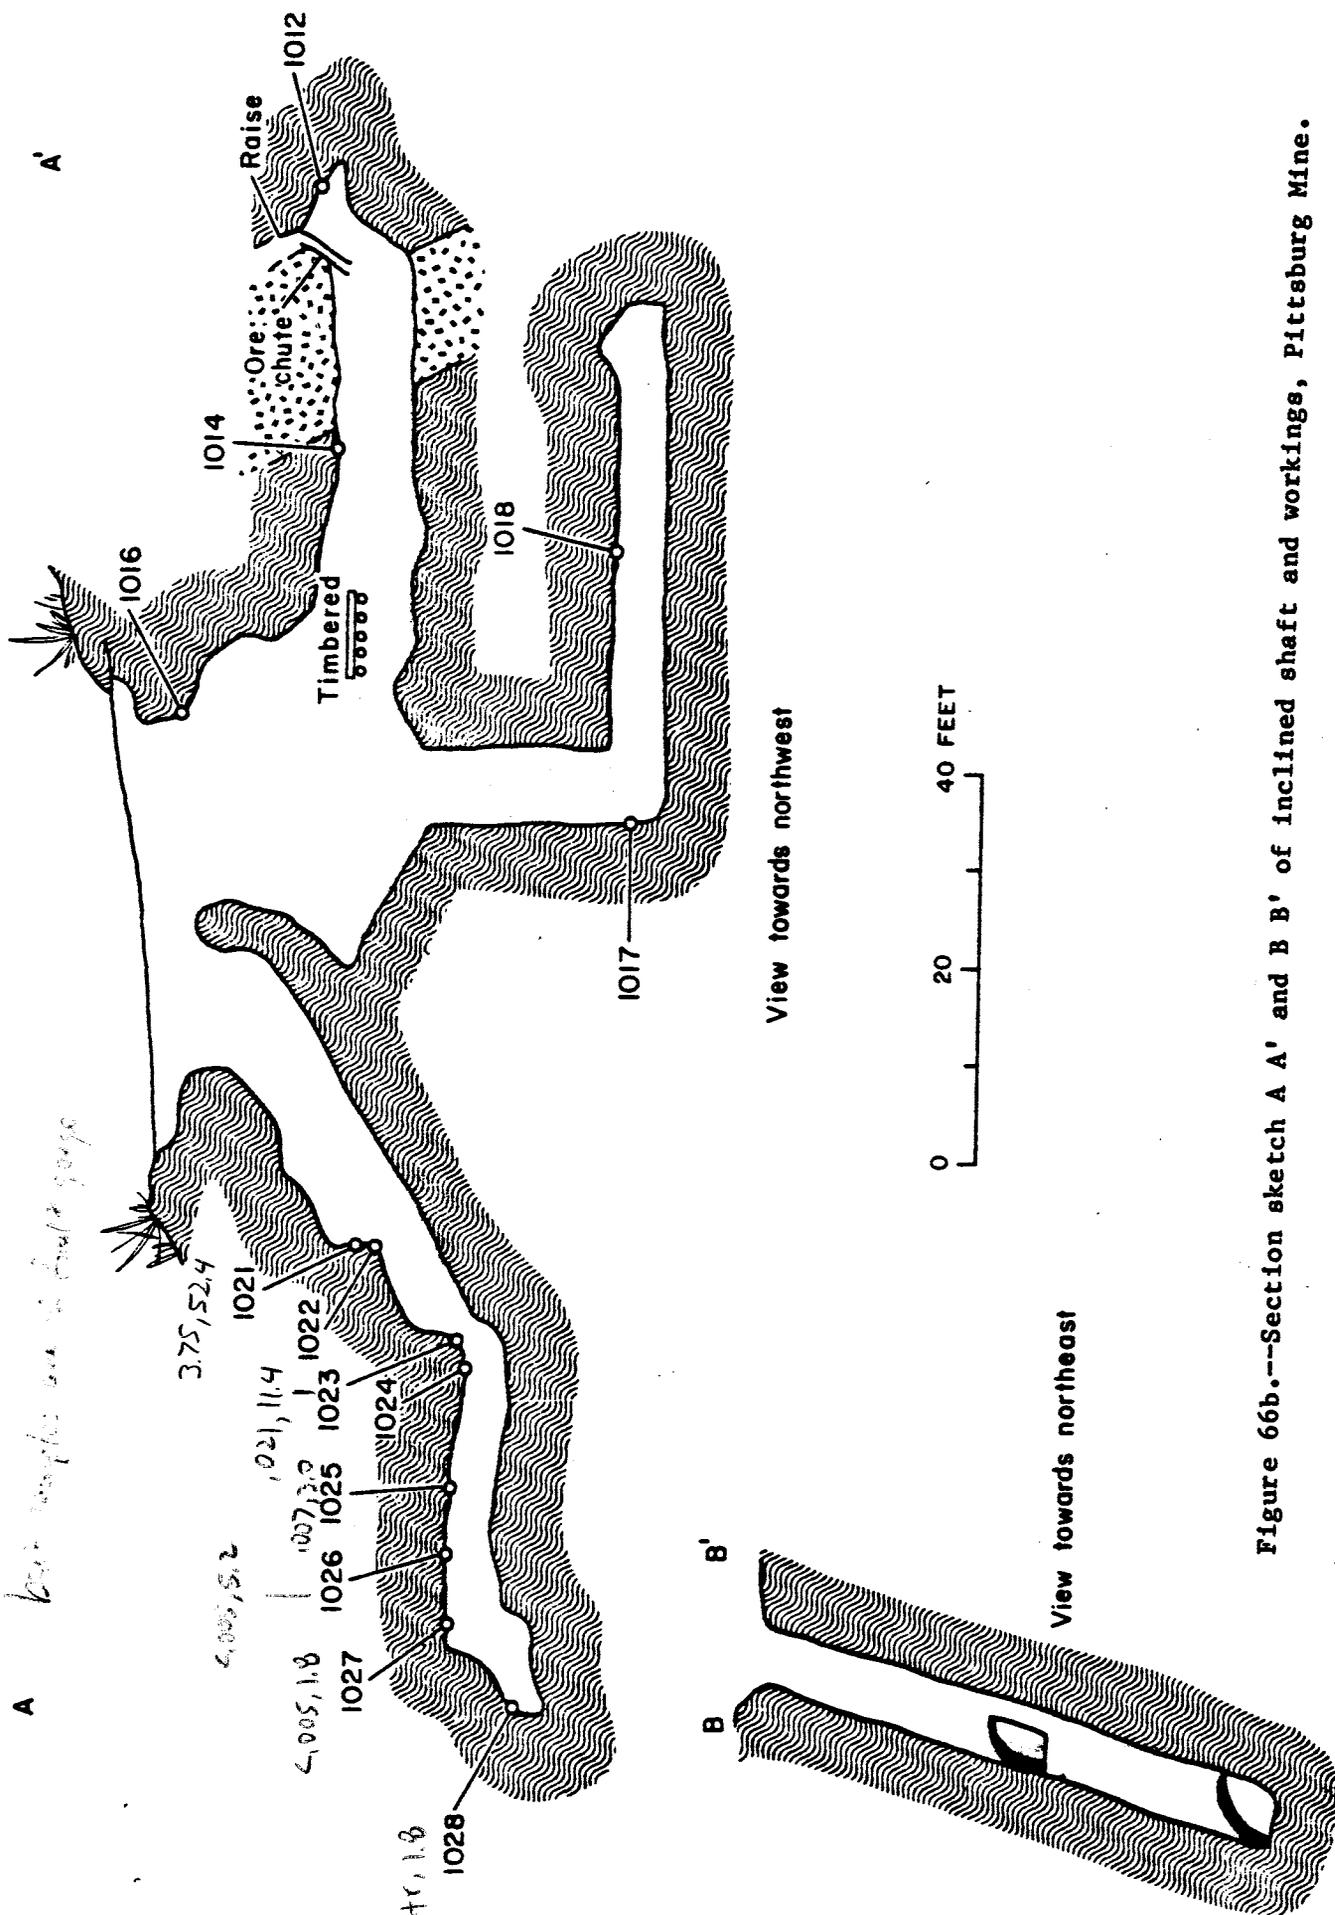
Section sketch A A' and B B' of inclined shaft and workings, Pittsburgh Mine.
